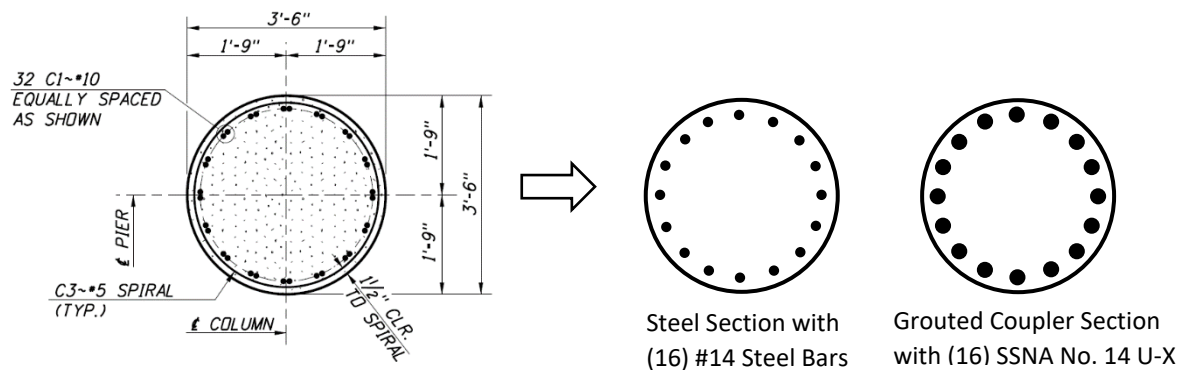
Column Steel and Grouted Coupler Sections (NTS) (Ebrahimpour, et al. 2016)
